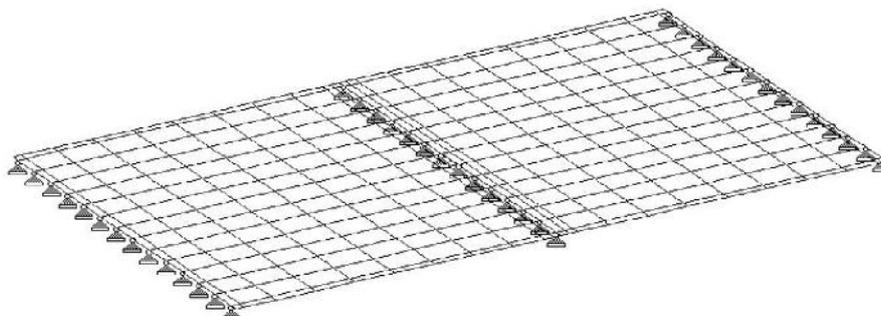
3-D Model of Integral bridge (U & W Girder)
